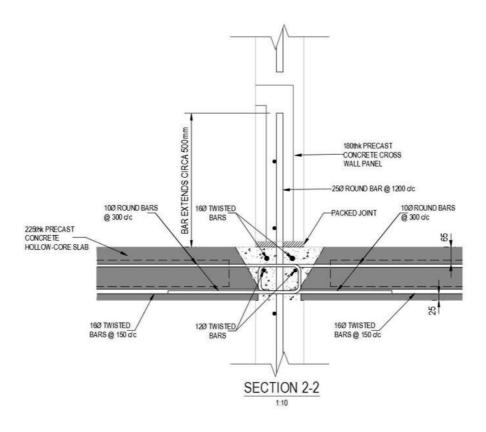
Example of insitu joint between precast concrete units (Cross Wall to Floor Slab)
